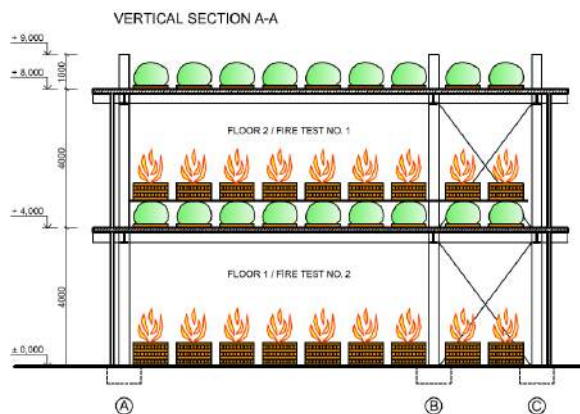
Structural scheme to demonstration fire test on complete composite building.
